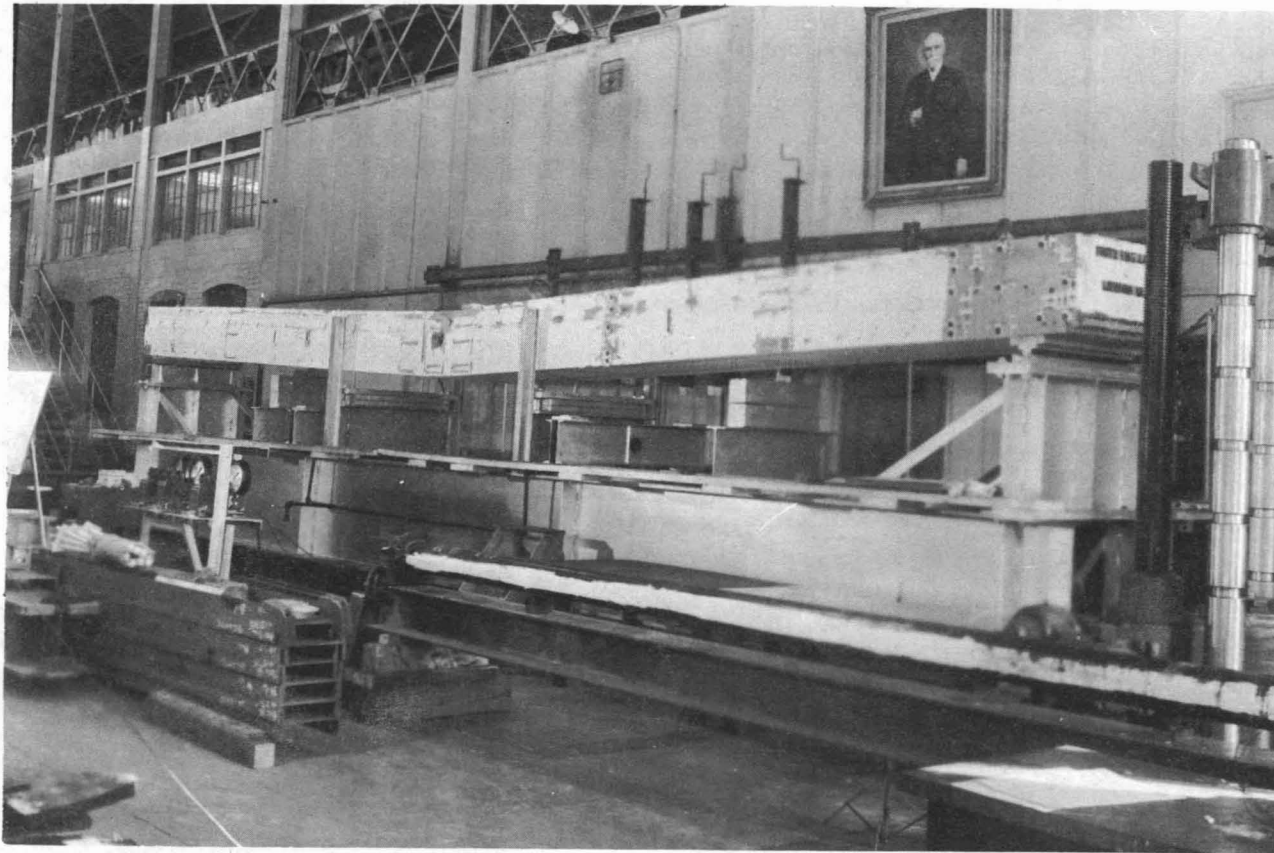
TEST BEAM AFTER DESTRUCTION BY CENTER LOADING
